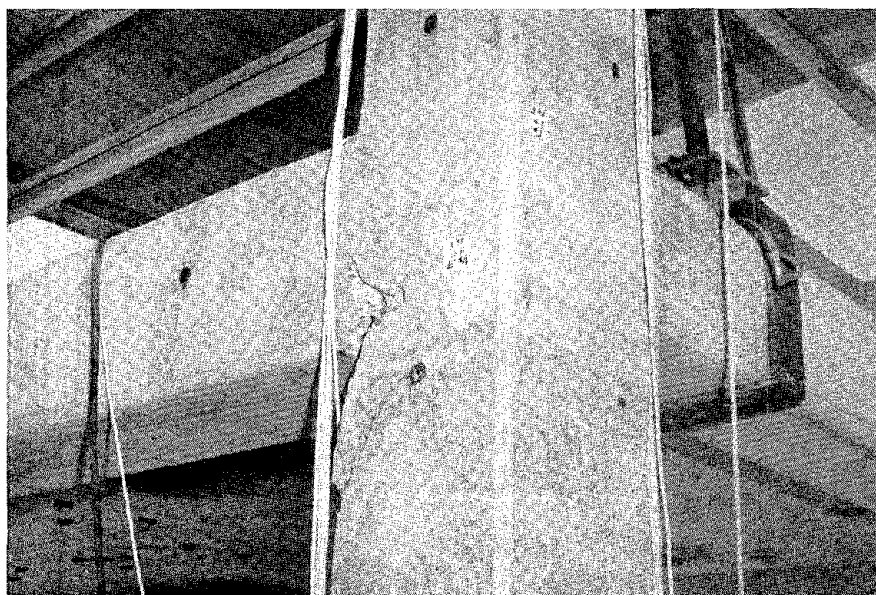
DAMAGE FROM THE 1979 TEST AT THE NORTHEAST CORNER OF THE THIRD FLOOR OF THE EPOXY-REPAIRED STRUCTURE
